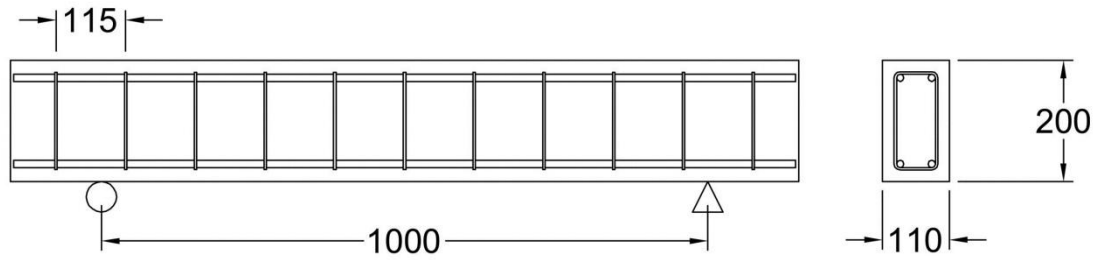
Longitudinal and transverse cross-section for set B specimens
